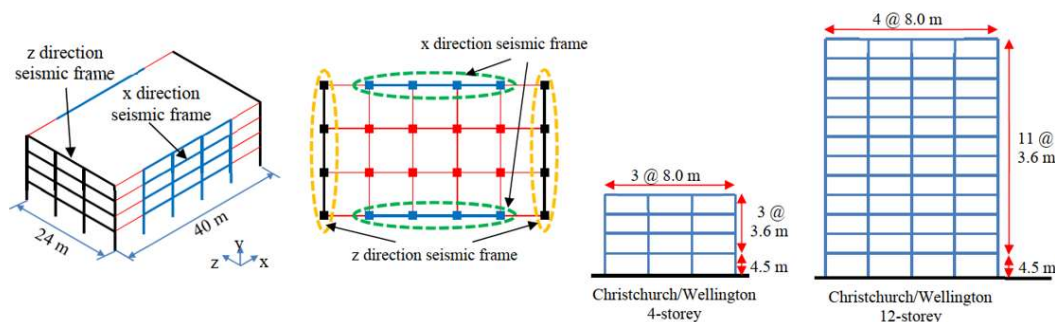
Layout of the case study buildings designed for Christchurch/Wellington conditions (Yeow, Orumiyehi, et al., 2018)
